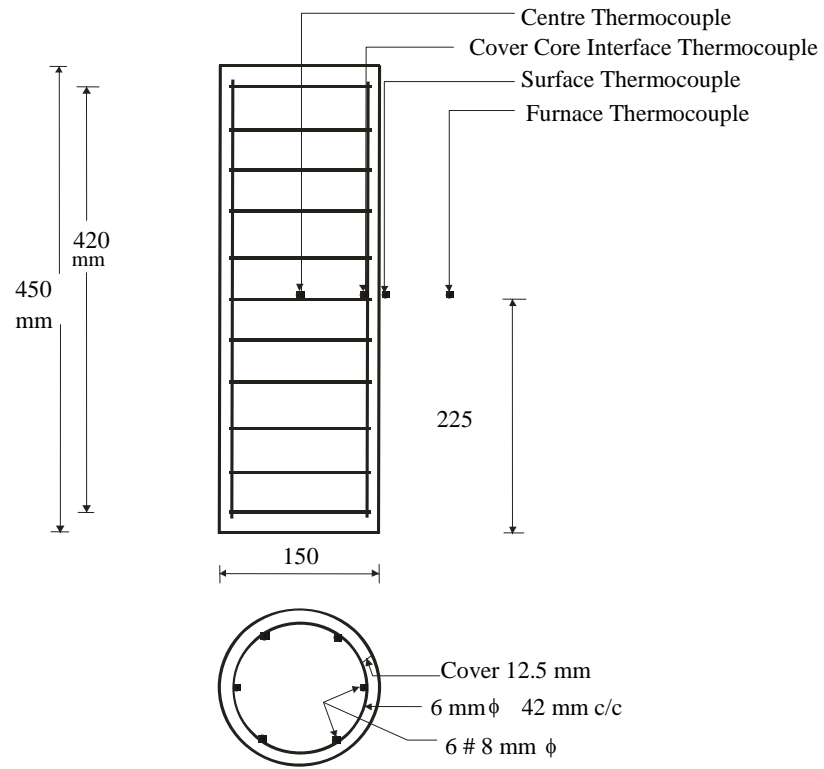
Details of confined HPC cylindrical test specimens and location of thermocouples
